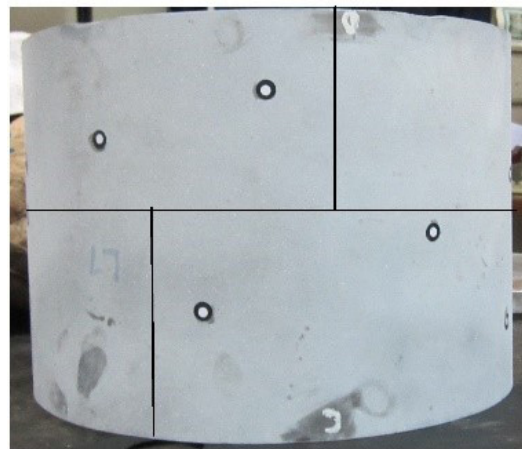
Longitudinal and Circumferential welds in specimen SLC1
